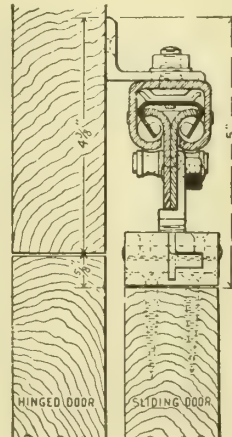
CROSS-SECTION 723 ELEVATOR DOOR HANGER
